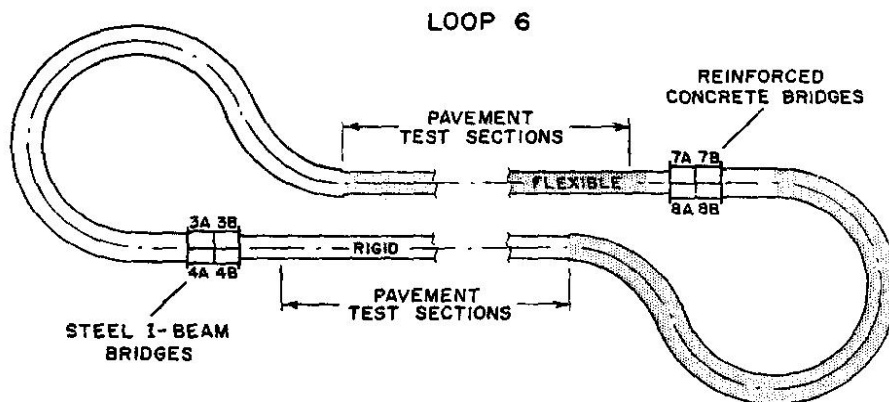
AASHO Road Test Bridge Locations, Loop 6 (AASHO 1962)
